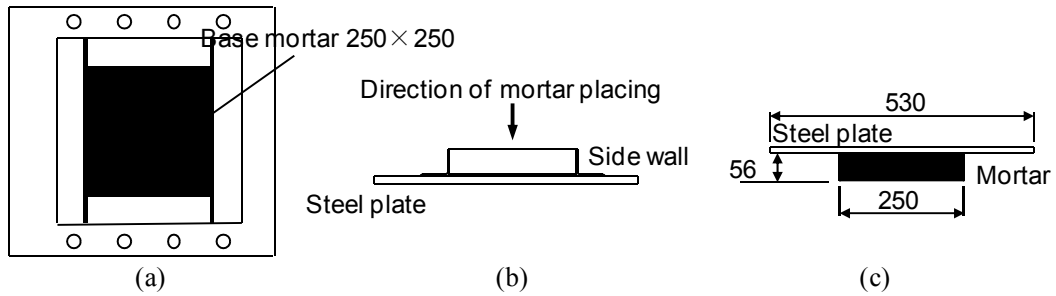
Specimen for steel and mortar (Unit: mm):
